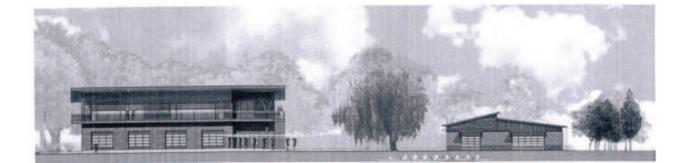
Front elevation showing the proposed Combined Colleges boathouse and CRA / Camrowers boathouse.
